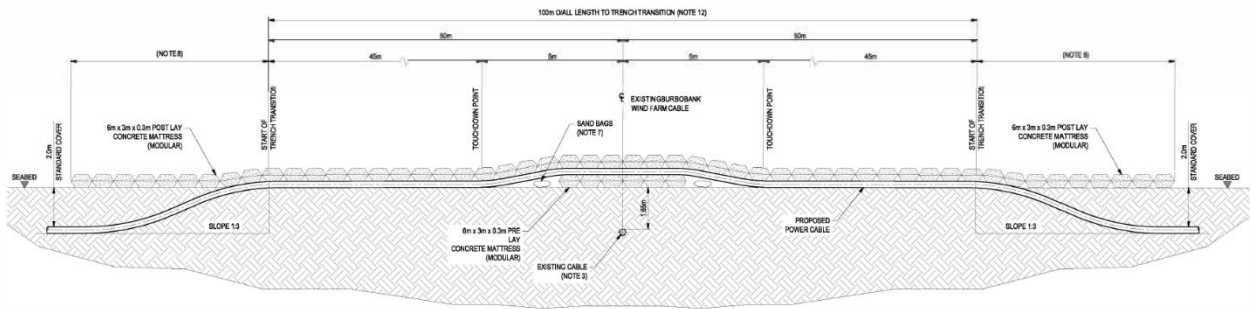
Typical Schematic Layout of Concrete Mattress Protection at Cable Crossing
